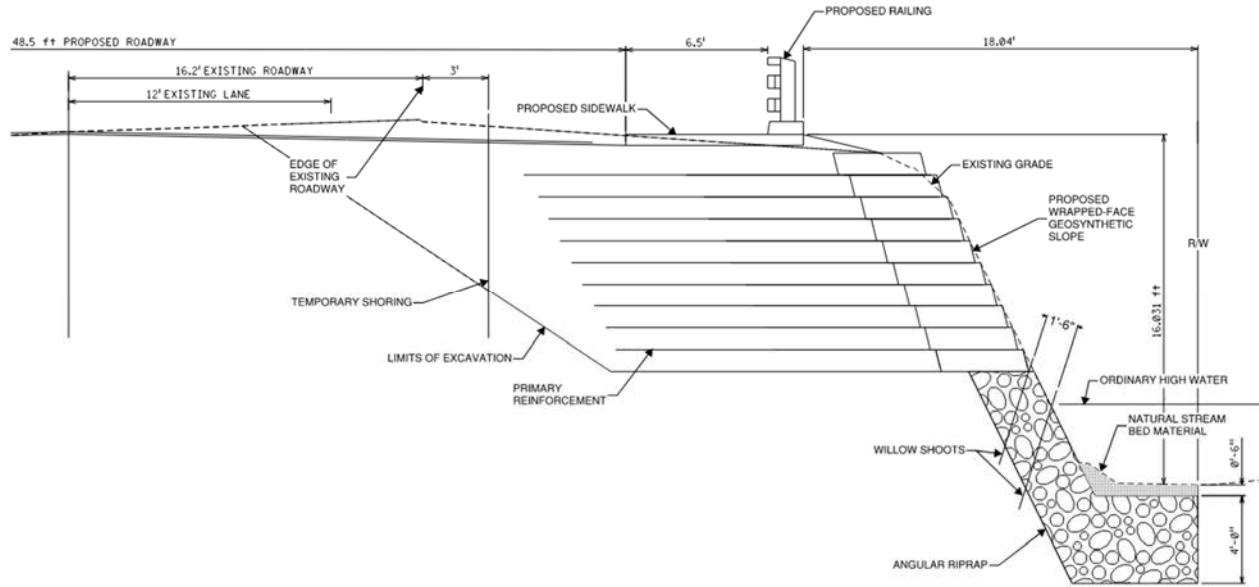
Wrapped Reinforced Slope Roadway Cross Section
